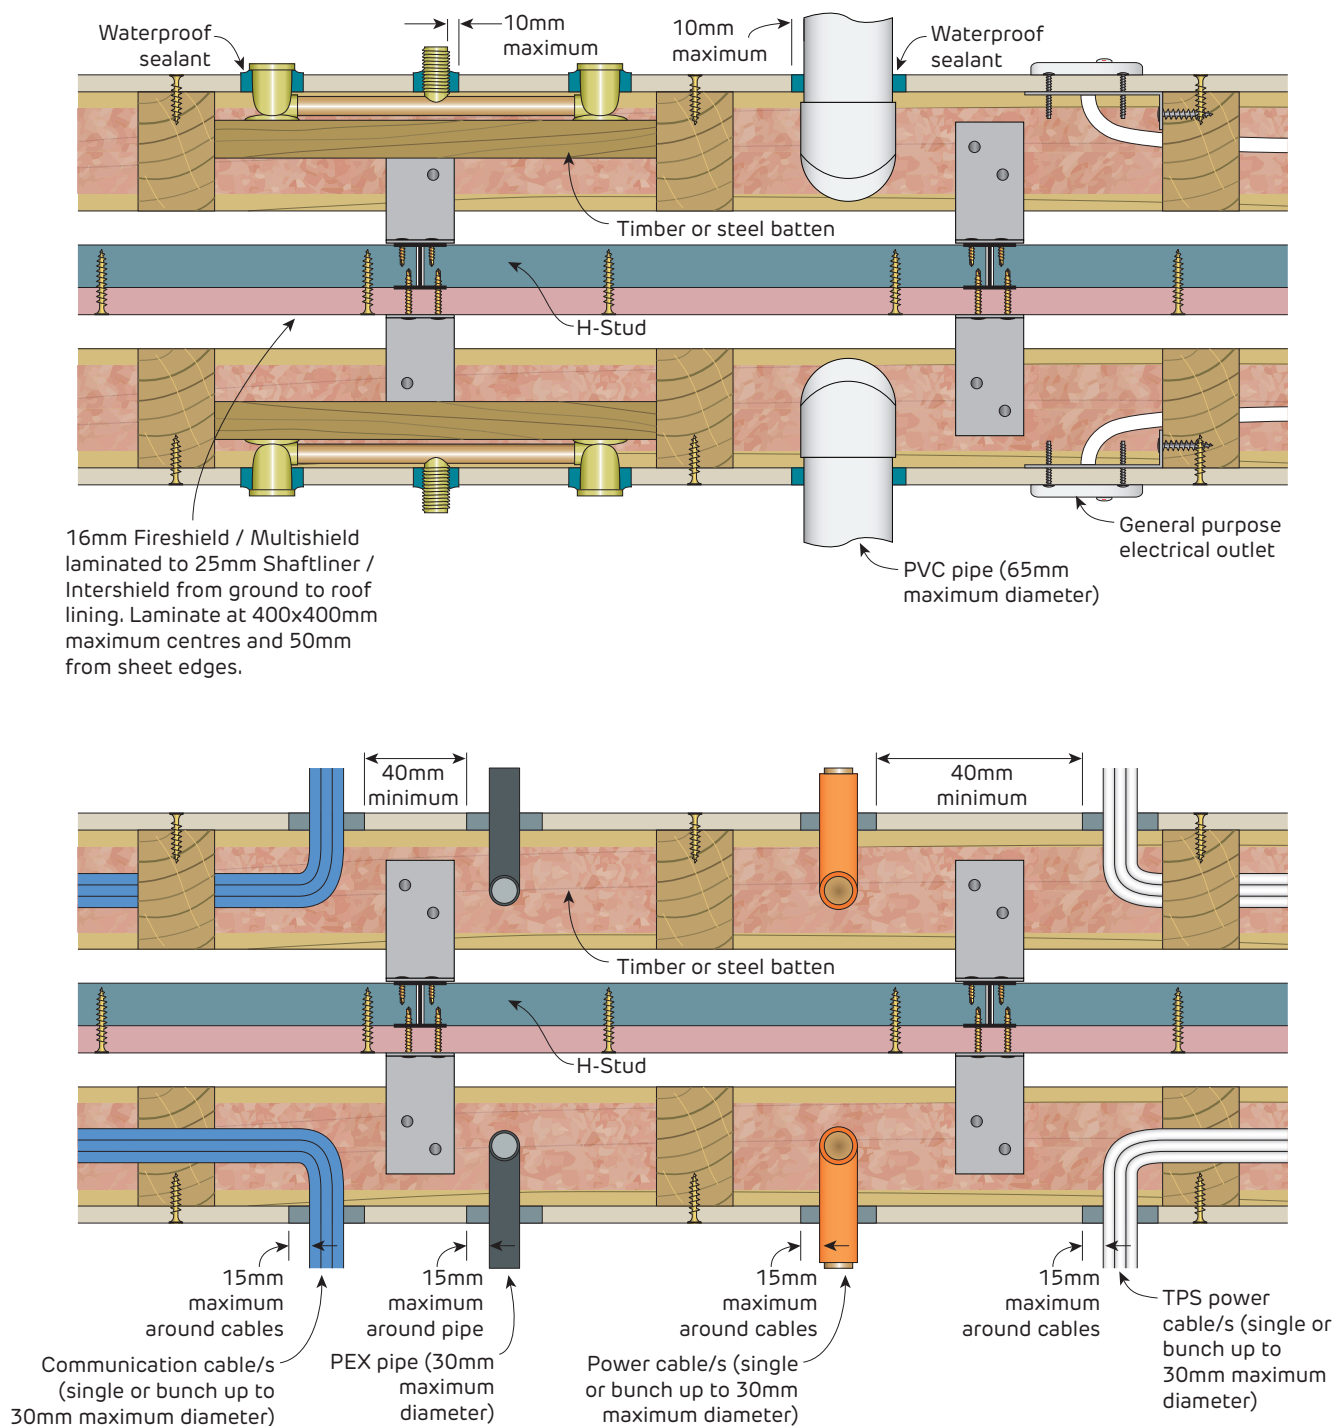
Plumbing and Electrical Penetrations in Wall Linings
